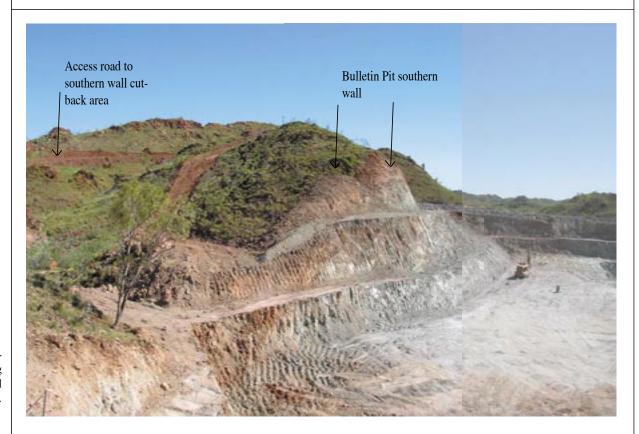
Bulletin Pit showing Southern wall cutback area.
